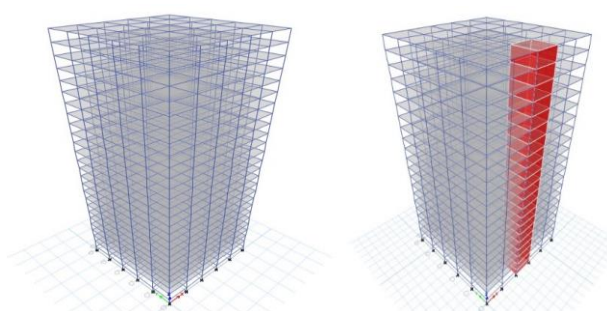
3D view of RCC, Steel and composite building and with shear wall
